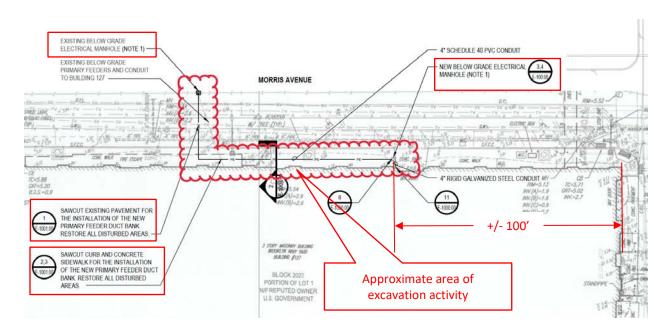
Section of Drawing E100.00 showing details of trench and manhole installation.
